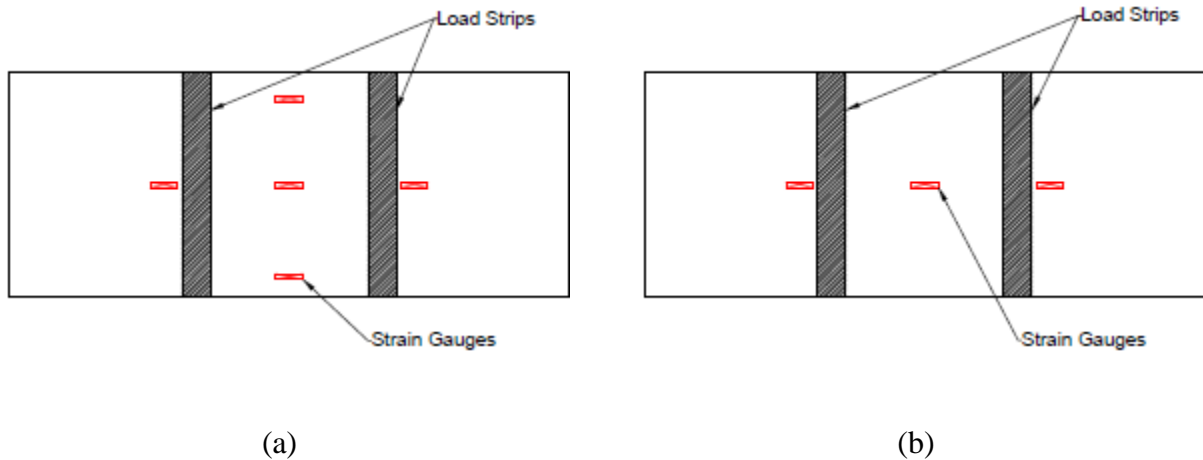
(a) Locations of Concrete Gauges on Compression Side; (b) Locations of Concrete Gauges on Tension Side
